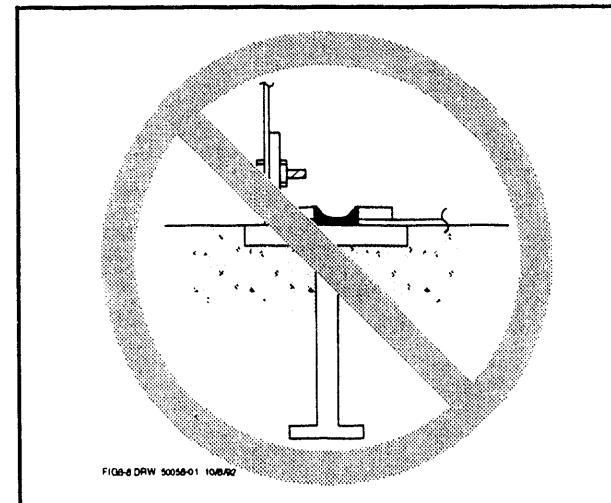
Plug welds have low capacity to resist uplift
